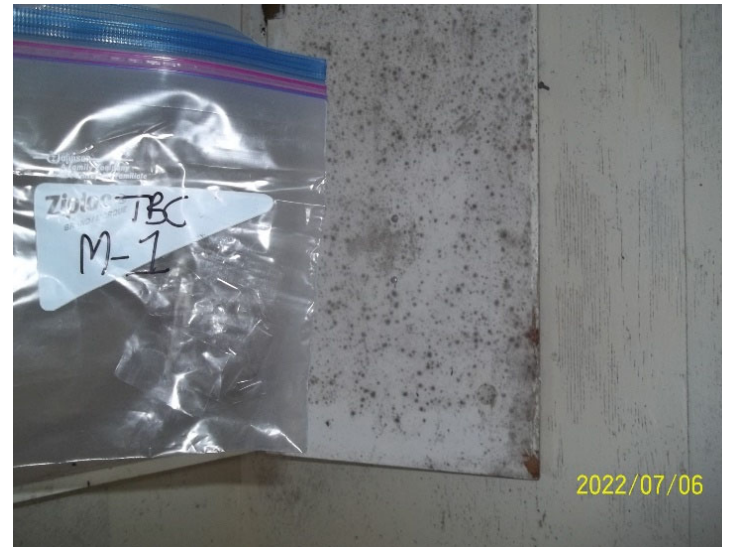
View of mould sample TBC M-1, wall, cabin interior.
